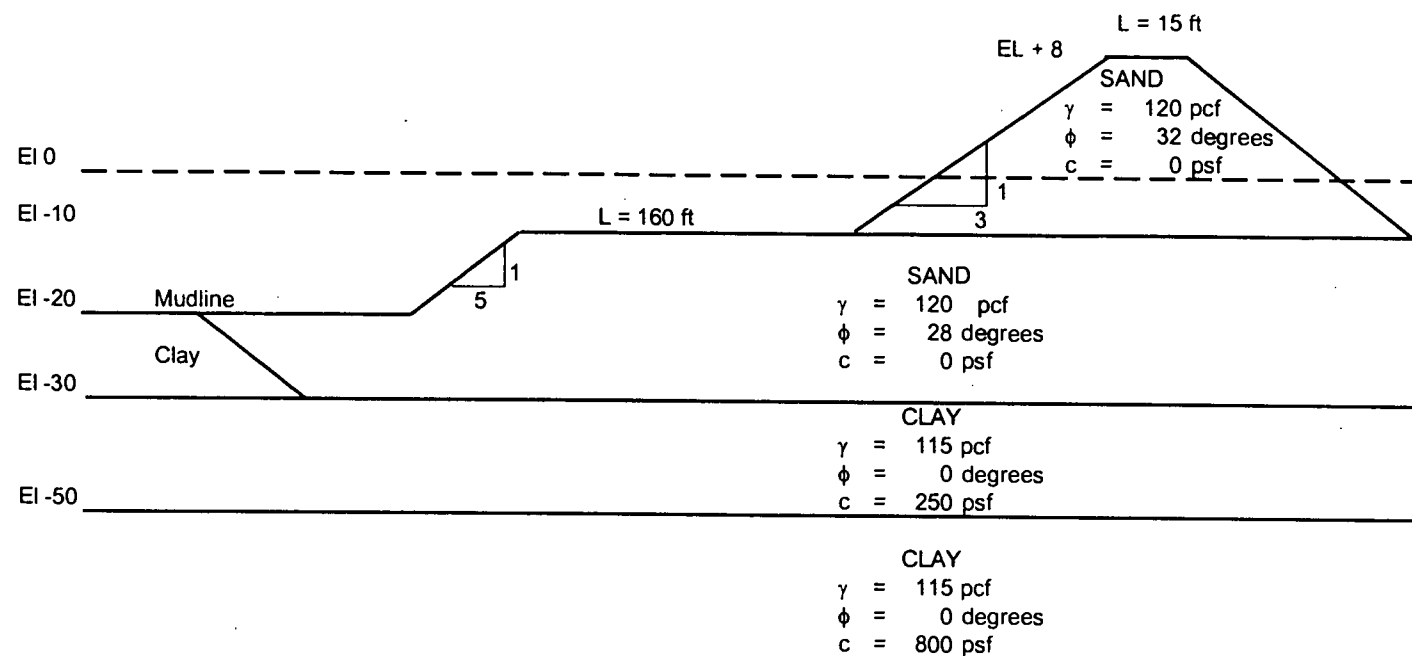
Recommended Dike Section Site 4A - EL. +8
